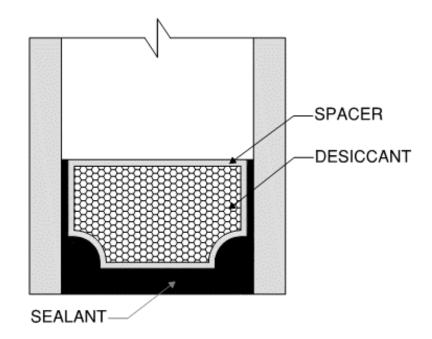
1 Desiccant in double pane insulating glass unit
